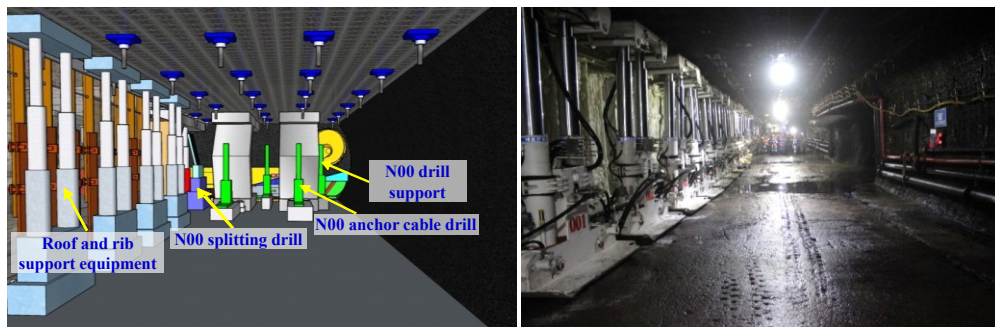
Four roadway forming matching equipment system (He, 2016)
